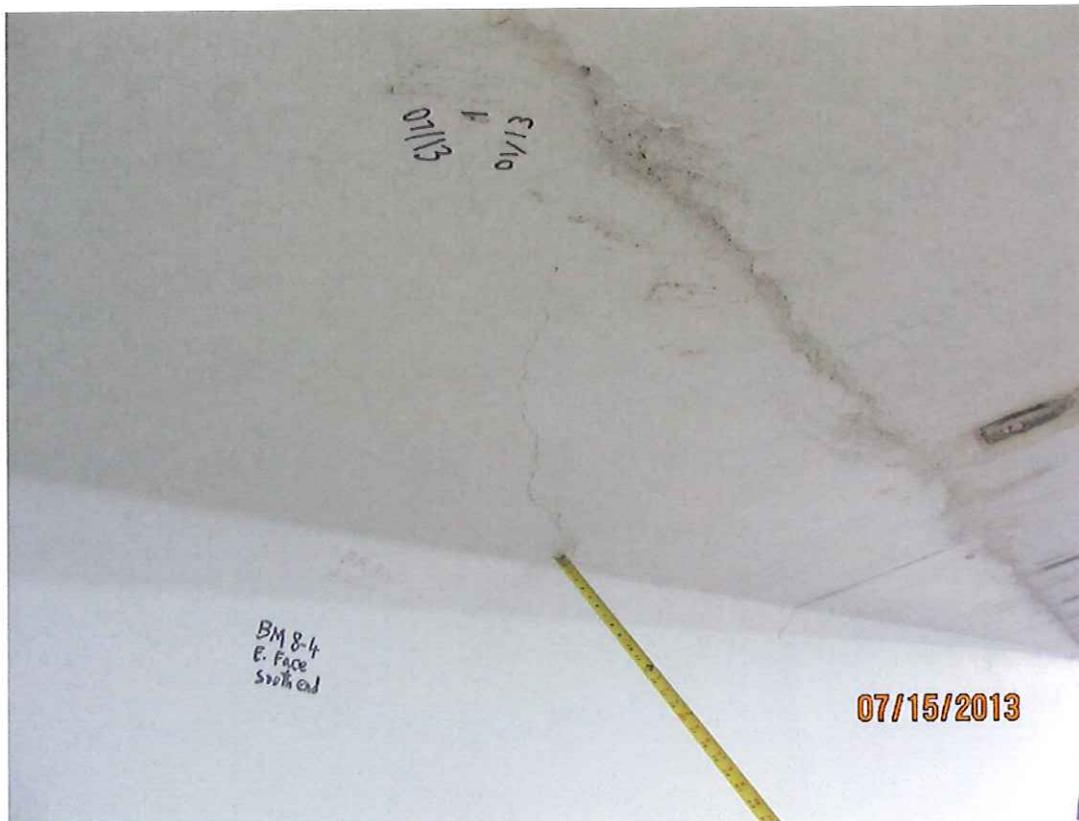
Longitudinal crack at web to top flange juncture 10ft. from south end of Beam 8-4
